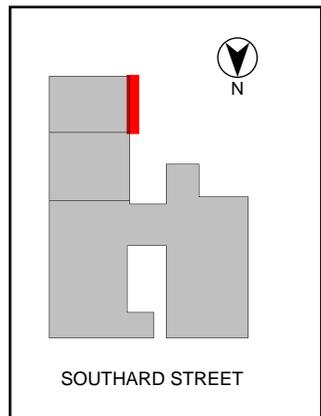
EAST WING, WEST SIDE, REAR ADDITION
